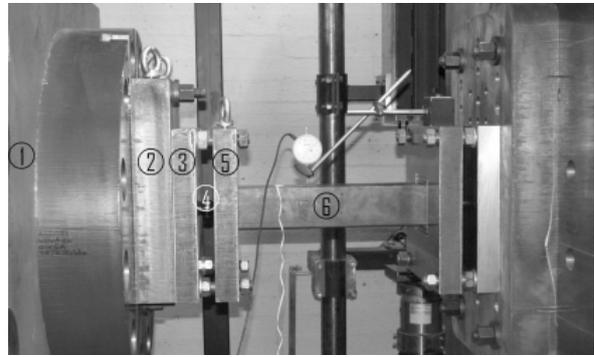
Test arrangement 1) load frame 2) attachment plate 3) outer end plate 4) steel ball 5) inner end plate 6) test piece
